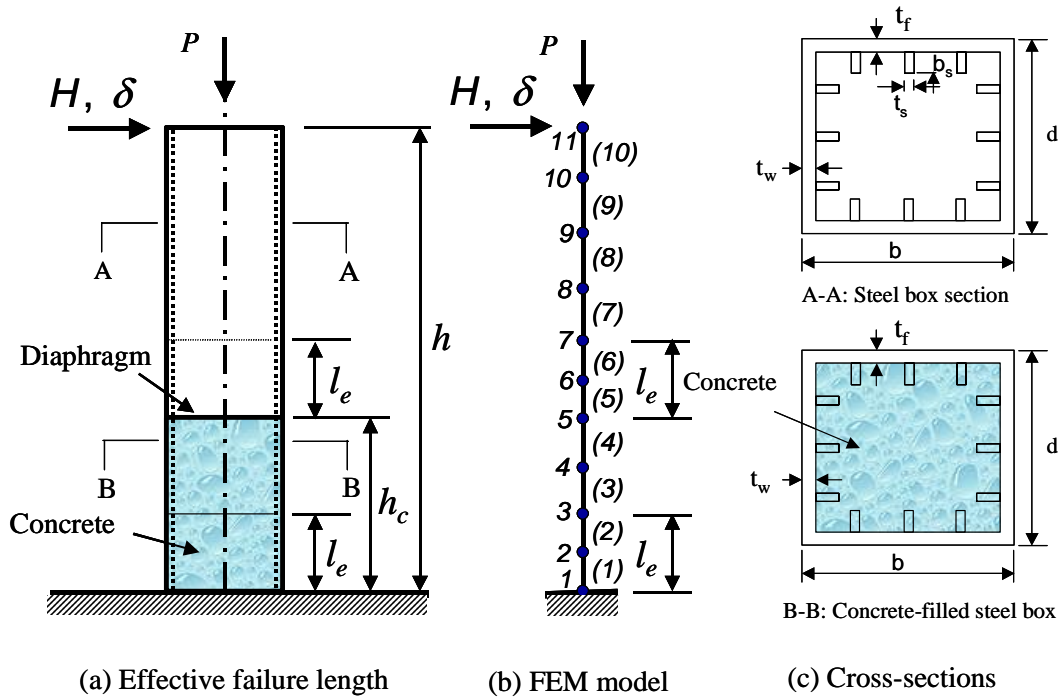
Analytical modeling of partially concrete-filled steel box columns.
